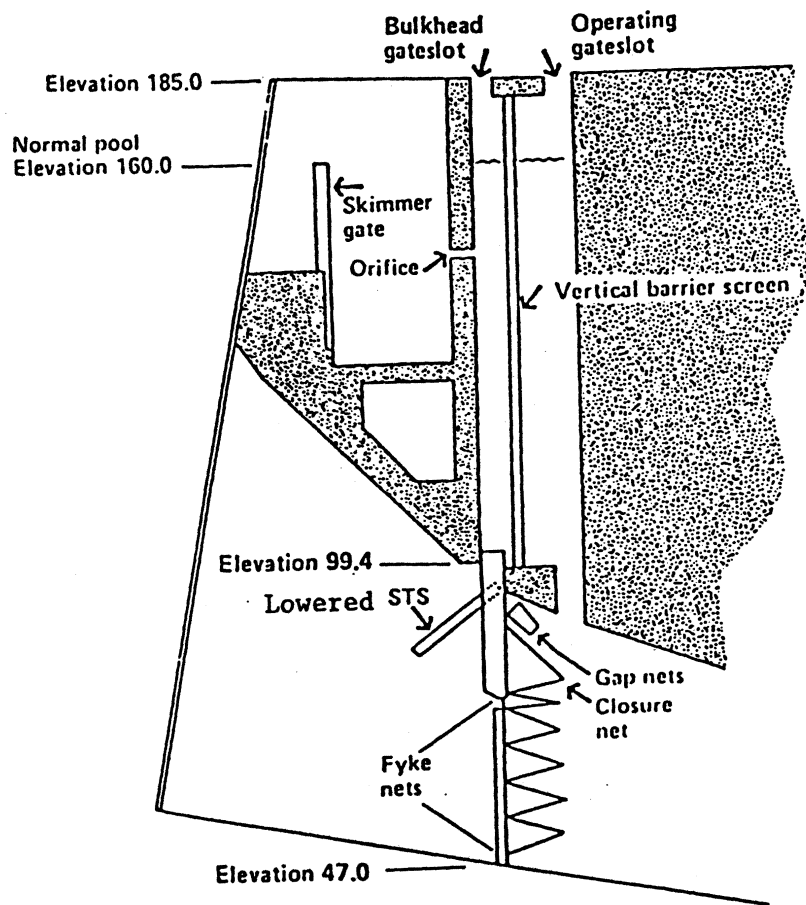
Transverse section through a typical turbine intake at the Dalles Dam showing the STS and the layout and elevations of the fyke nets used for FGE testing.
